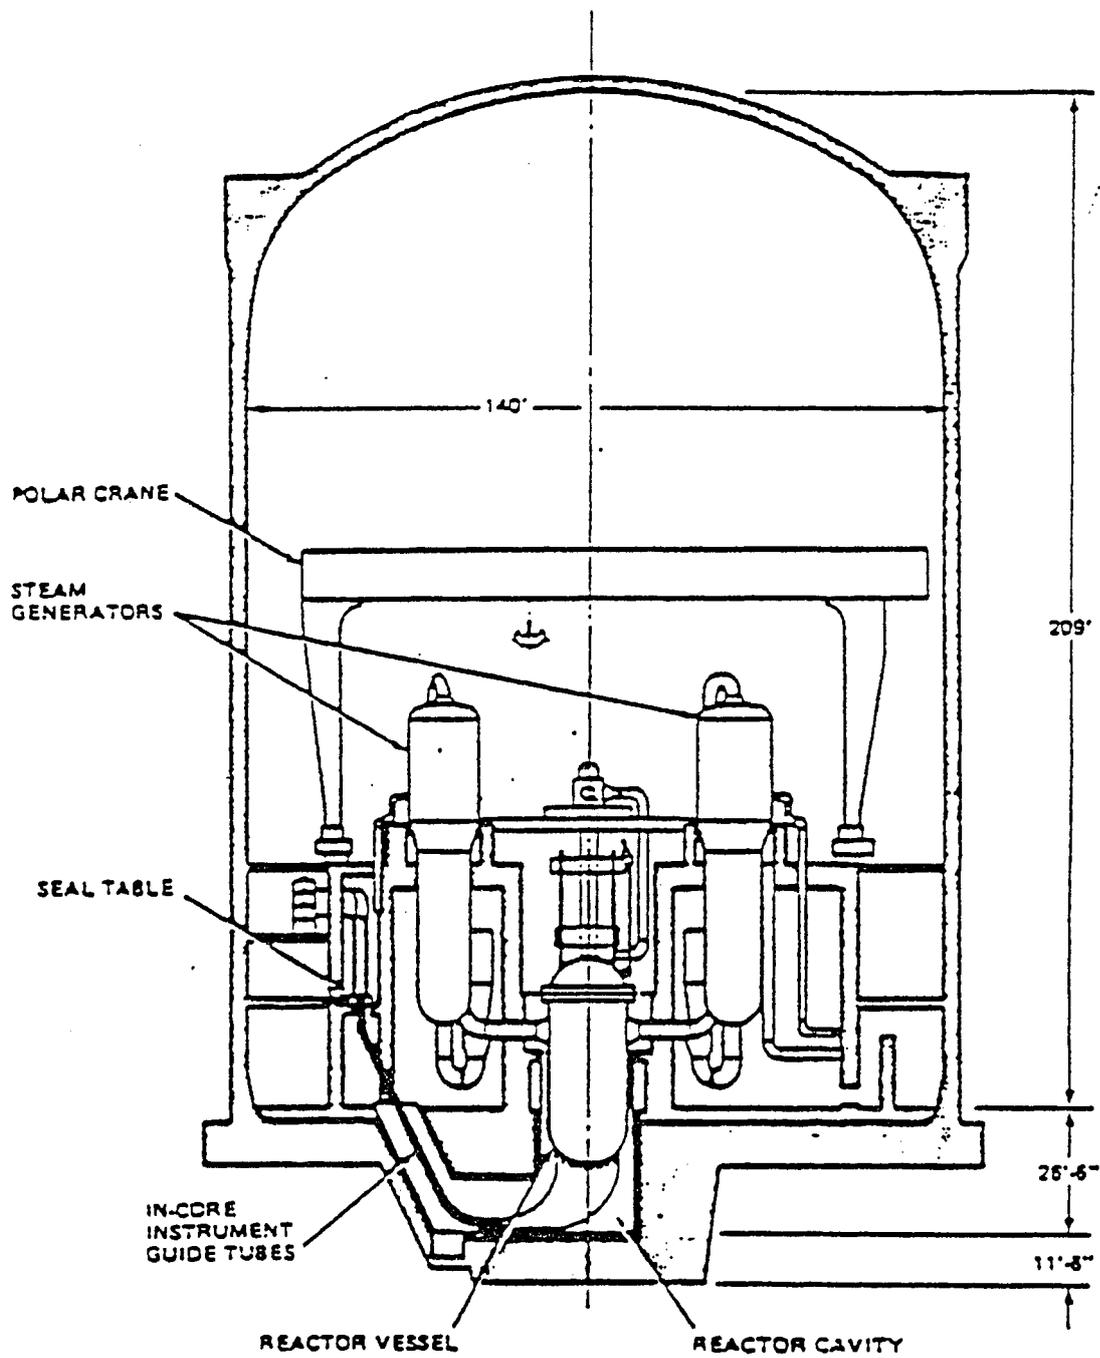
PWR Large/Dry Type Prestressed Concrete Containment.
